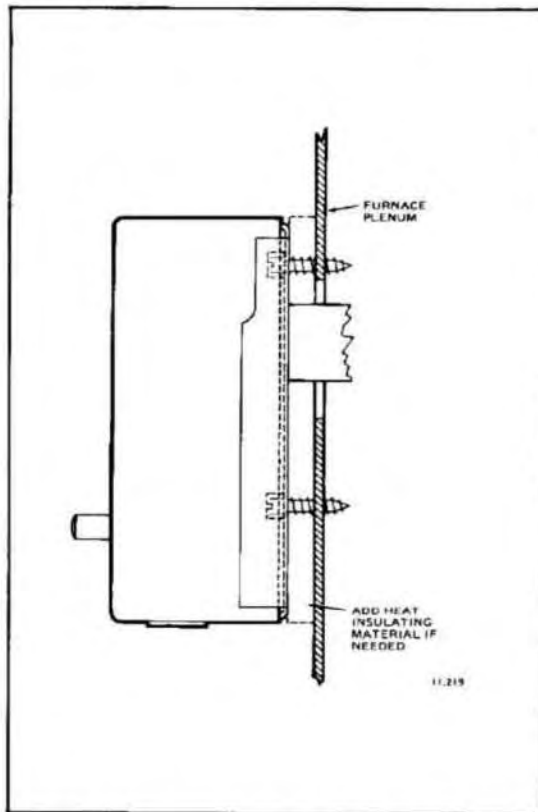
SURFACE MOUNTING FOR L4064. THE L4064C AND D REQUIRE A 1-1/2 in. [38.1 mm] HOLE FOR ELEMENT INSERTION; ALL OTHER MODELS REQUIRE A 13/16 in. [20.6 mm] HOLE.
